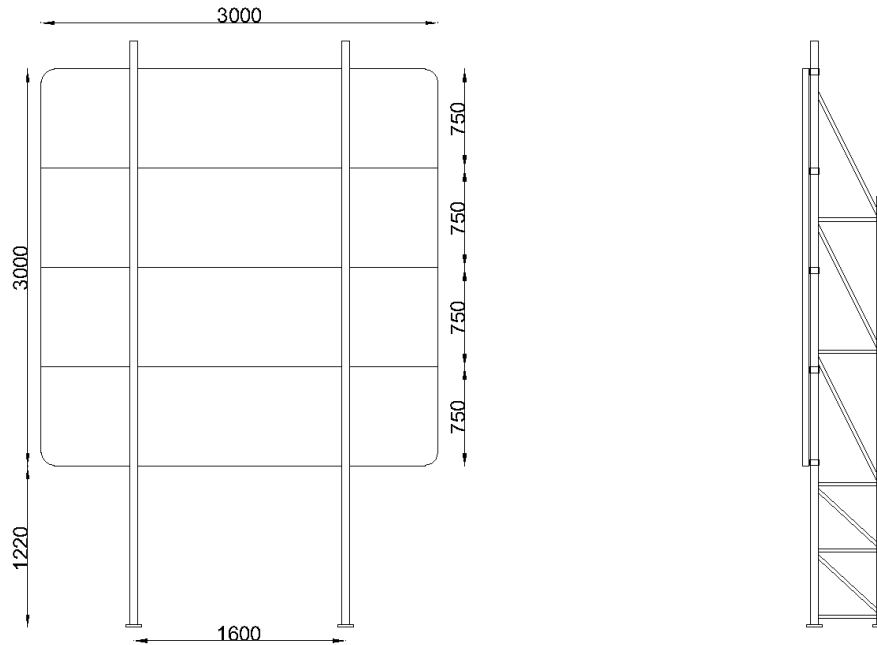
Drawings of the sign, dimensions in mm. Left: y-z view. Right: x-z view.
